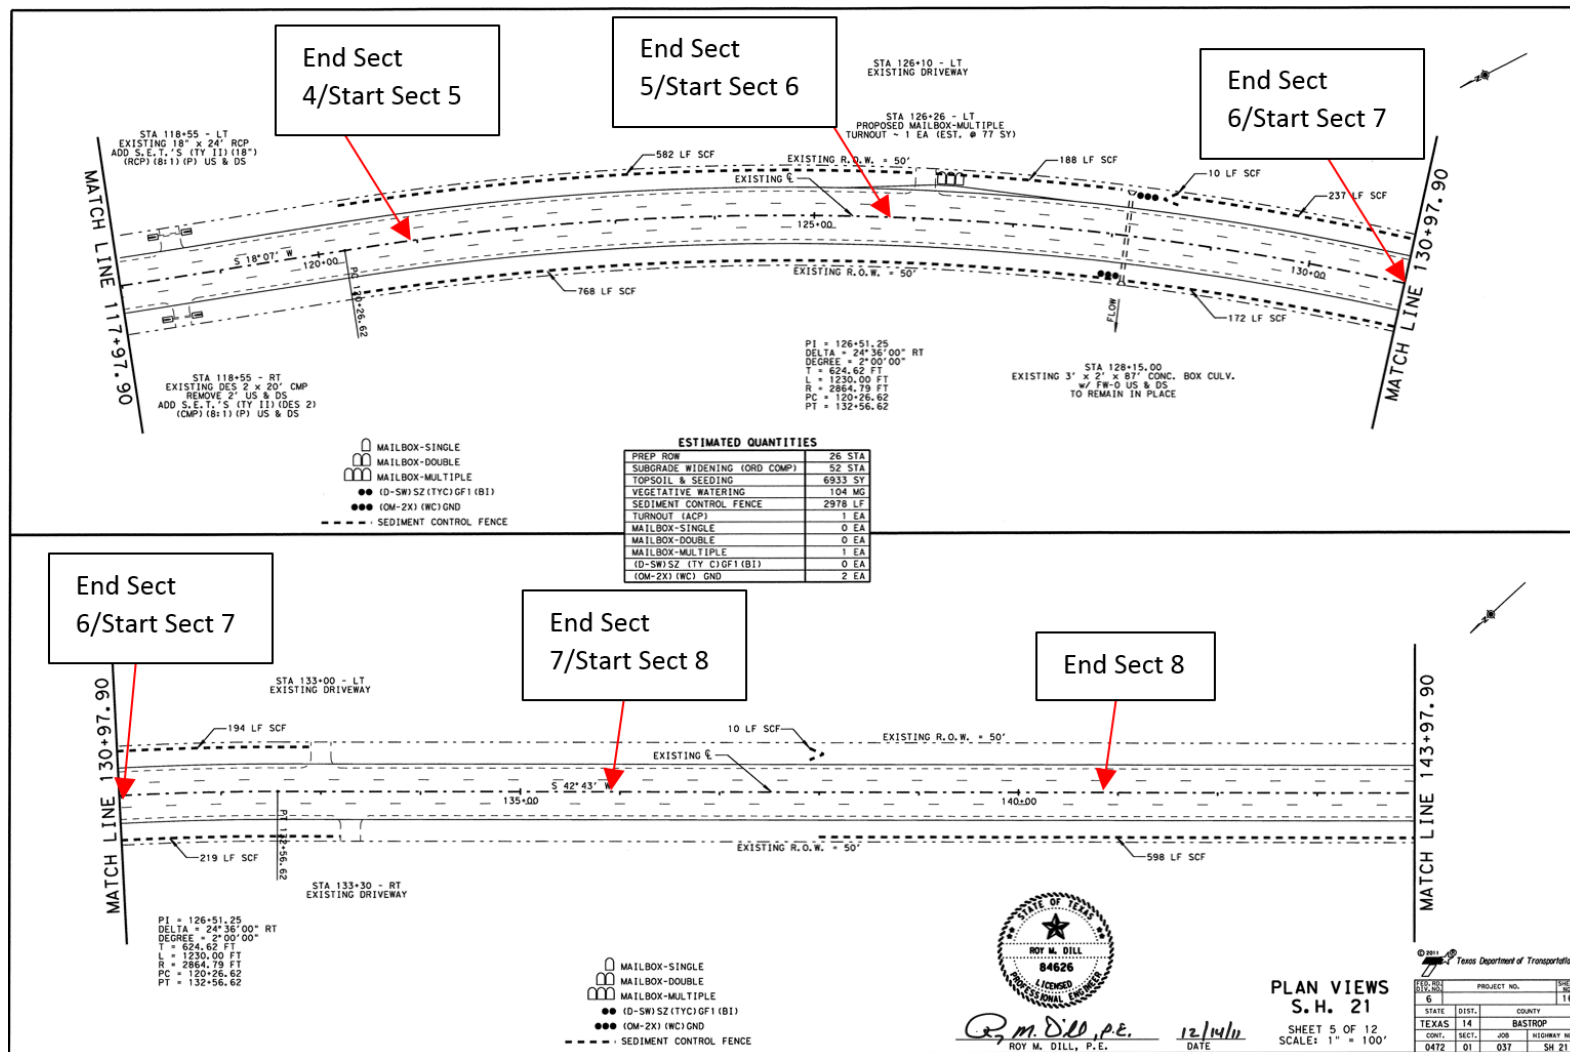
Design plans showing location of test Sections 4 through 8 and direction of surface runoff
